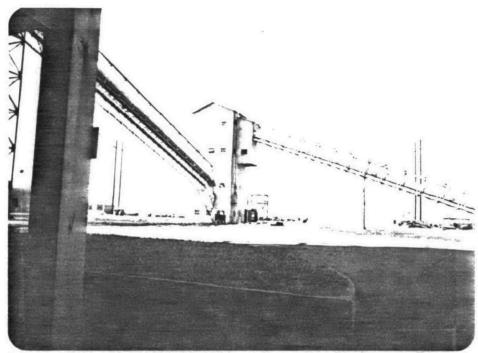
View from ground level facing southwest showing the coal conveyors and the transport house.
